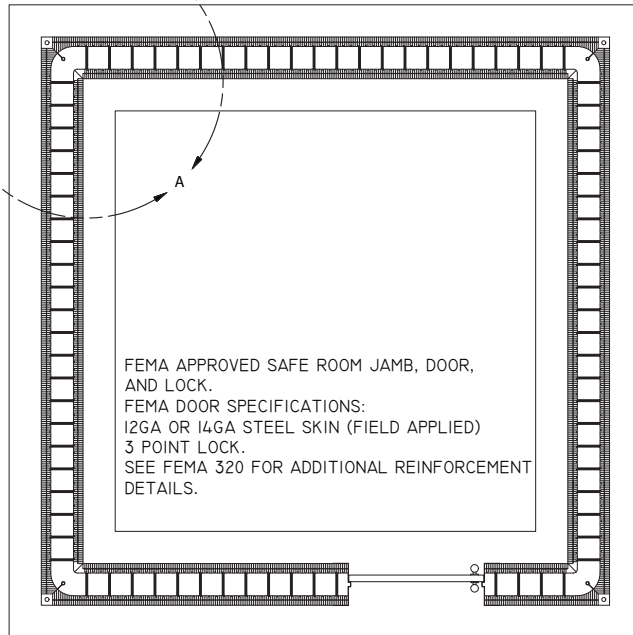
SAFE ROOM REINFORCEMENT AND STIRRUPS
